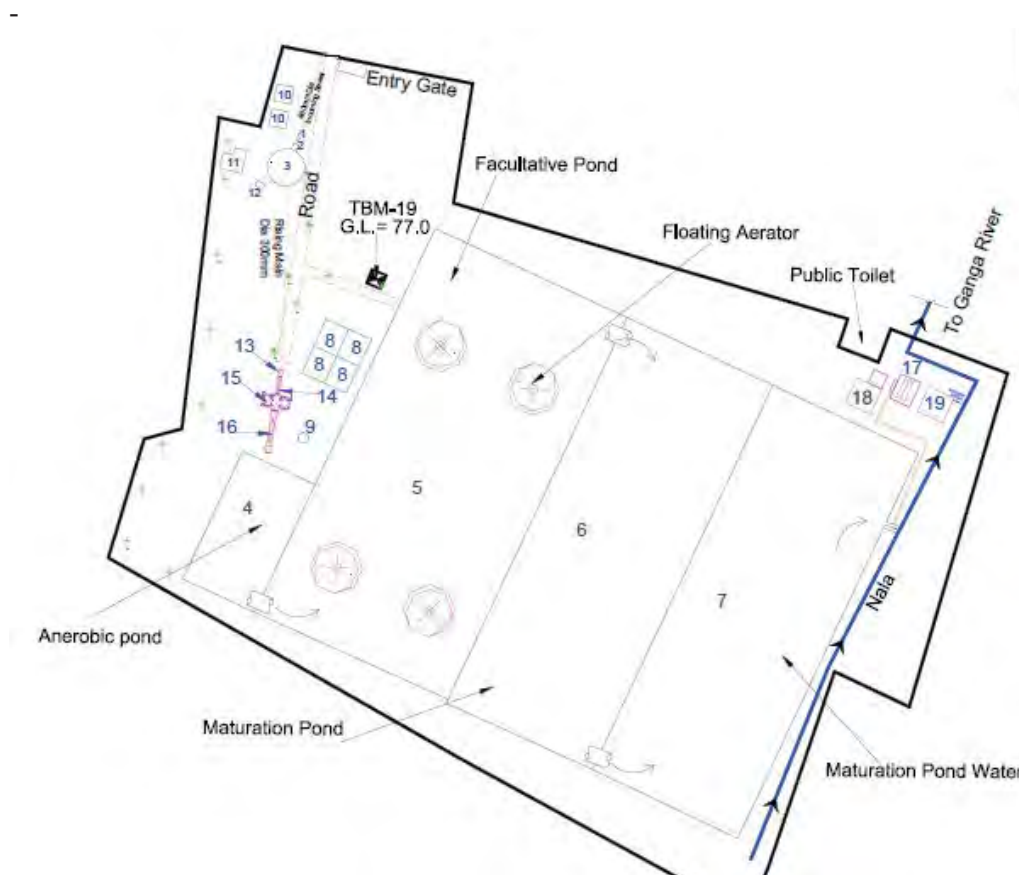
Layout at upgraded Vindhyachal STP (DPR plan)
